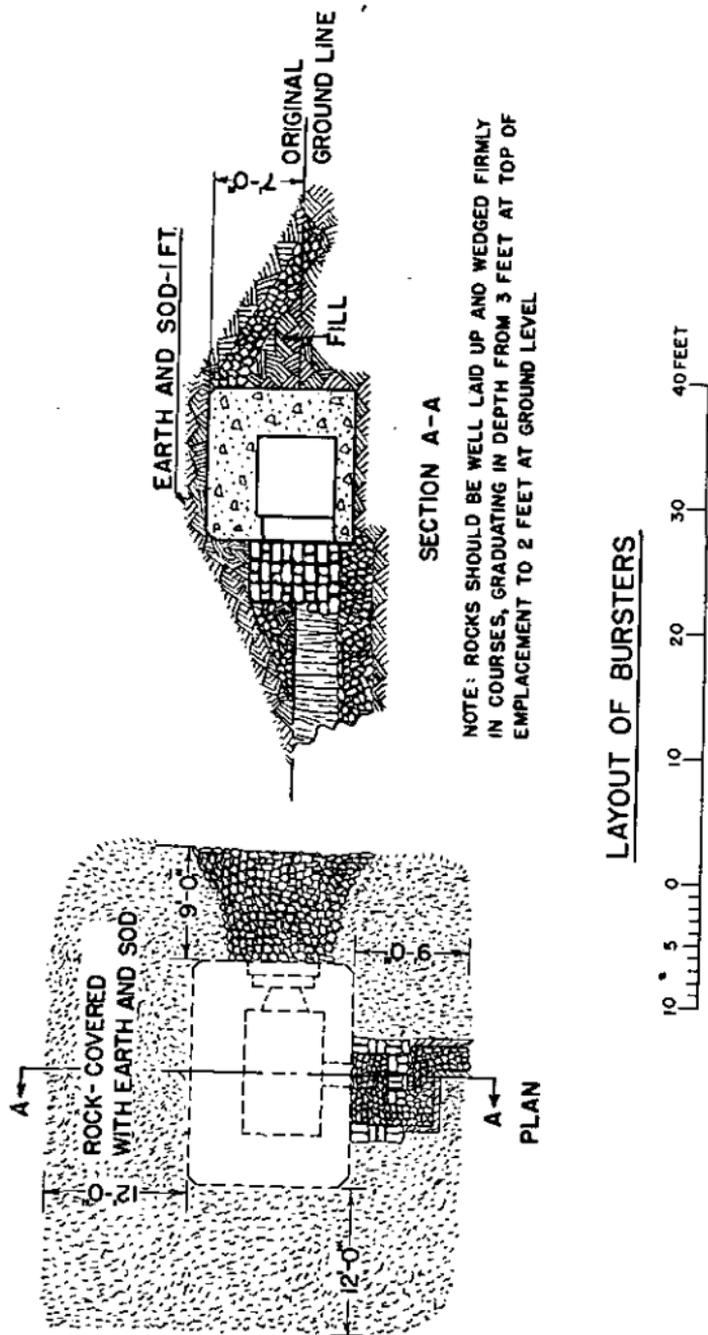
Layout of bursters, light shellproof machine-gun emplacement.
